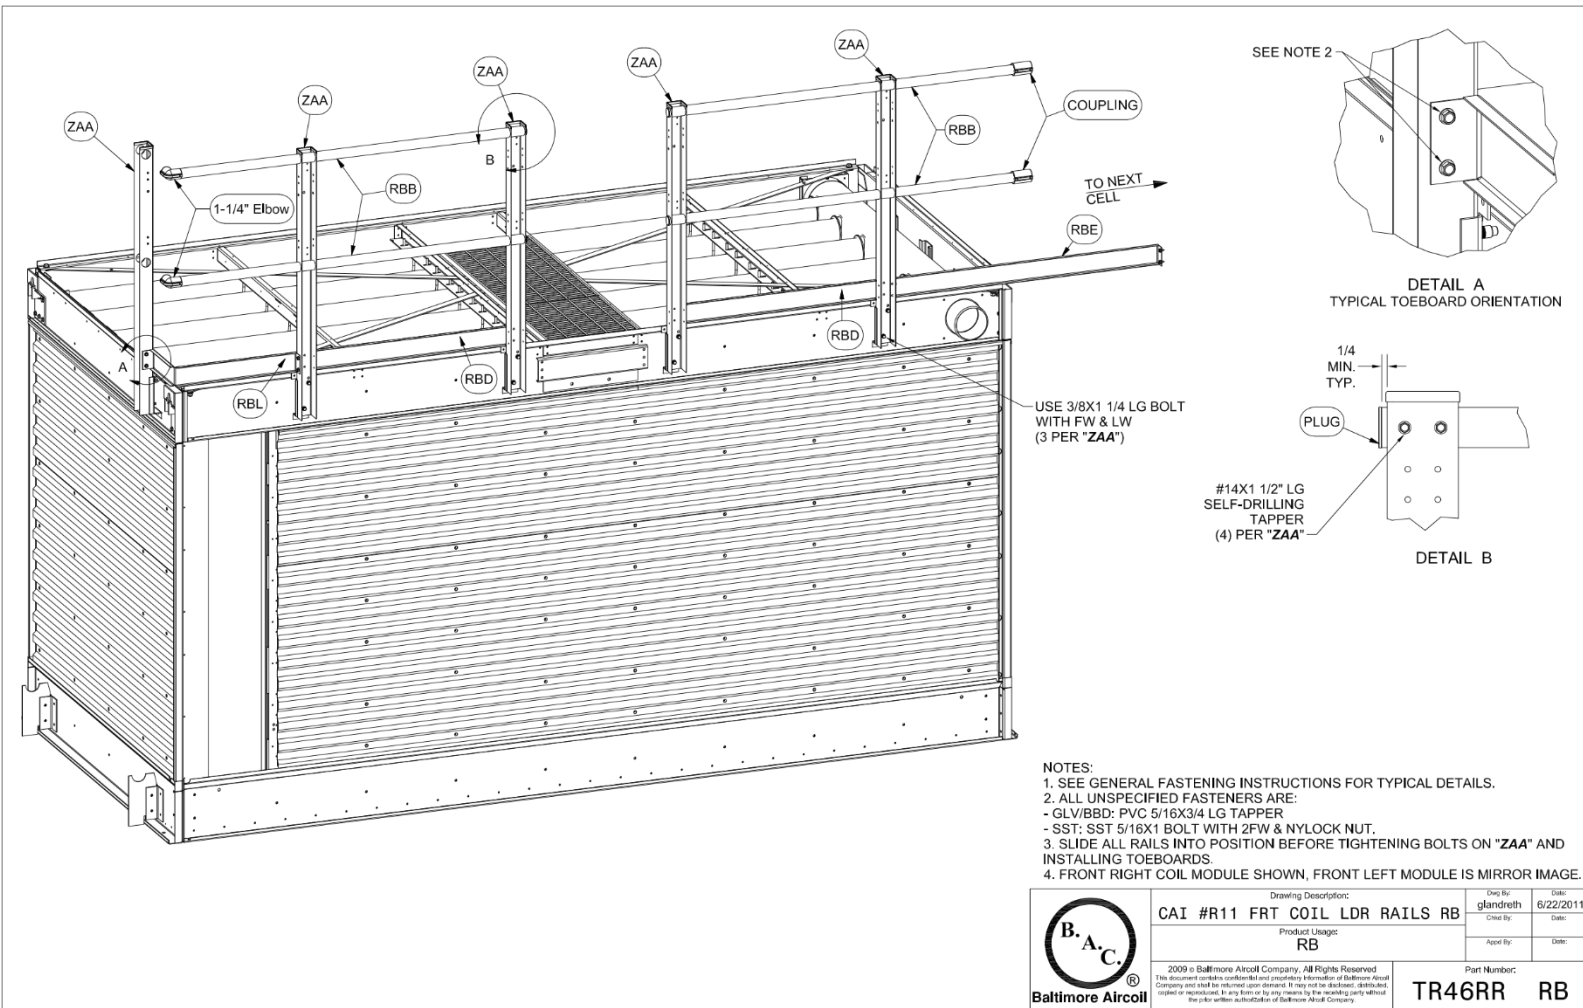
TR46RR Louver Face Railing Installation on Multi-cell Front Unit, with Ladder Opening
